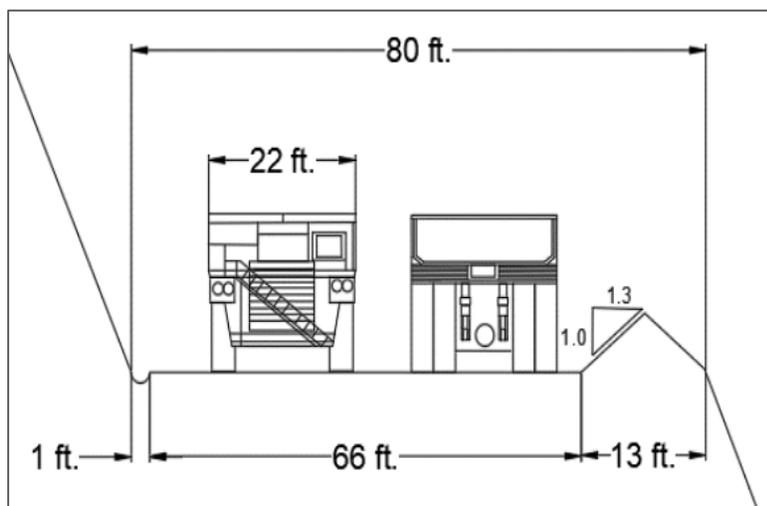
Example Double-Lane Design for 100-Ton Class Haul Truck
